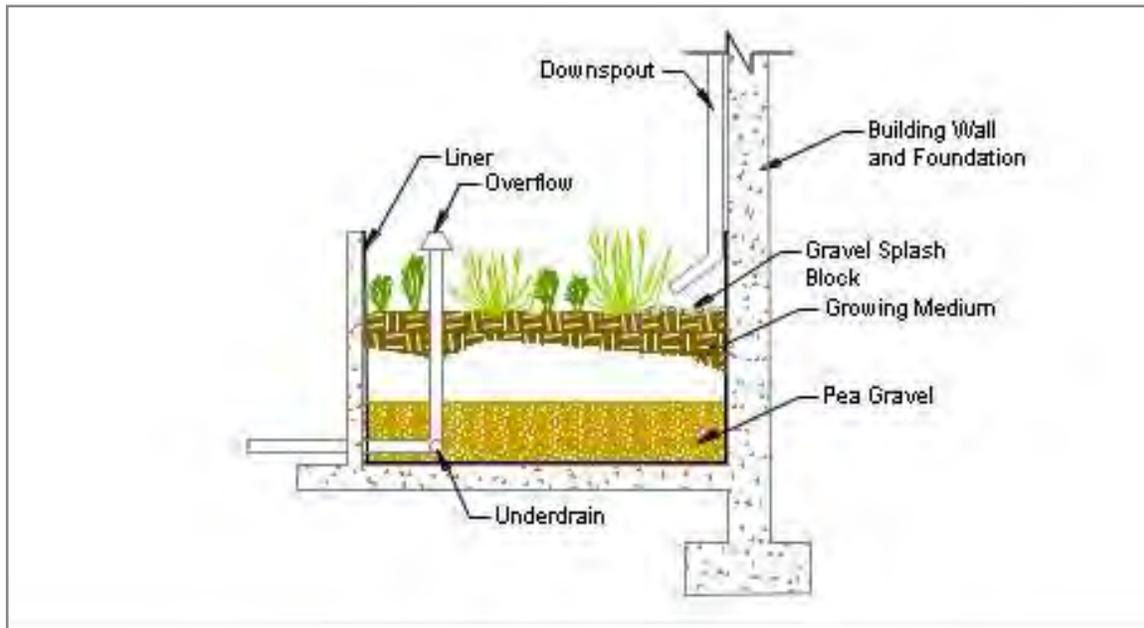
Stormwater Planter Box (Harris County LID Manual)
